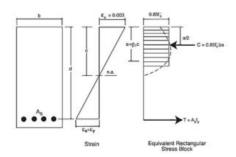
Equivalent Rectangular Concrete Stress Distribution (ACI)
